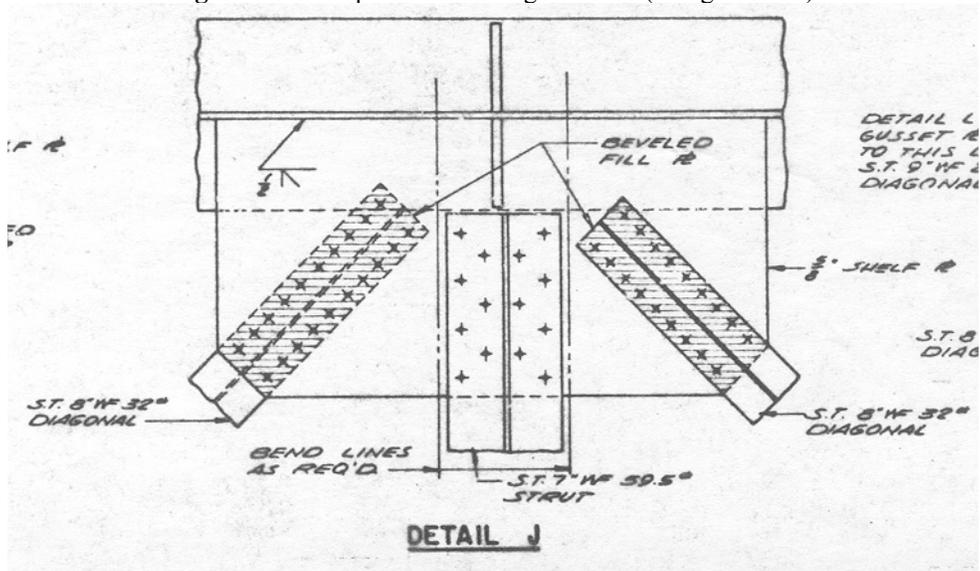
Shelf plate welded to girder web – plan view (Bridge # 9320)
